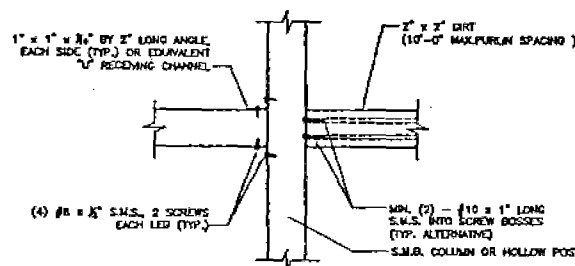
TYPICAL GABLE BEAM CONNECTION
